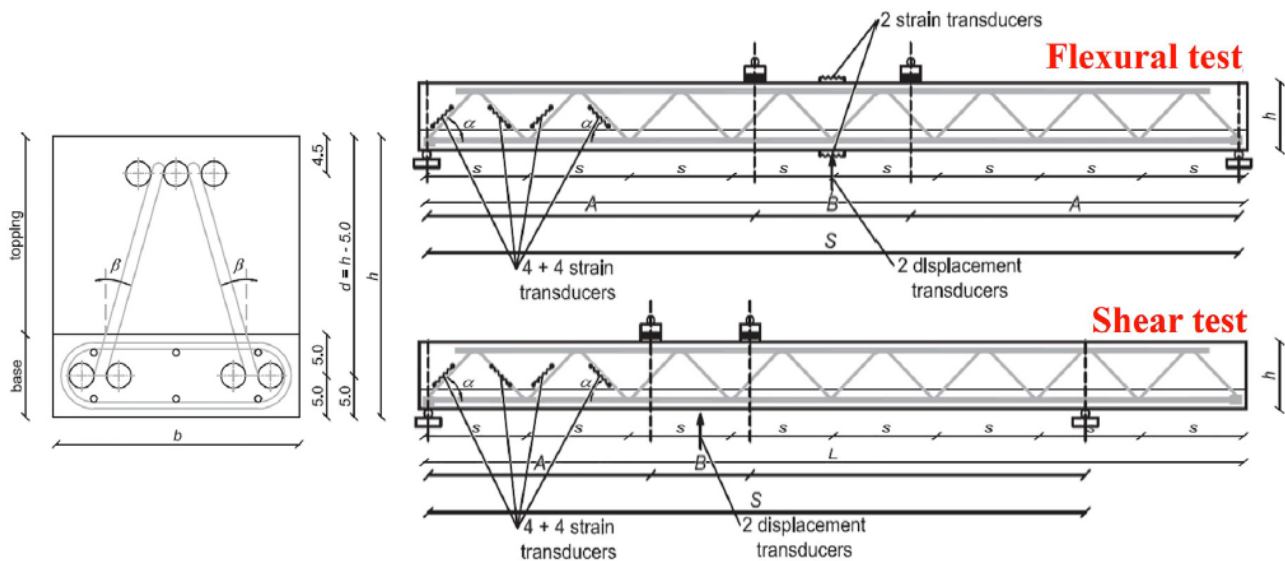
Specimens tested by Tesser and Scotta (dimensions in cm).
